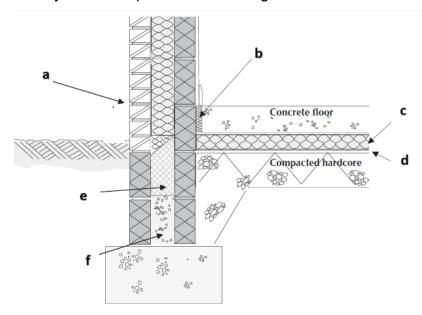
Concrete Ground-Bearing Floor with Structural Edge Insulation
